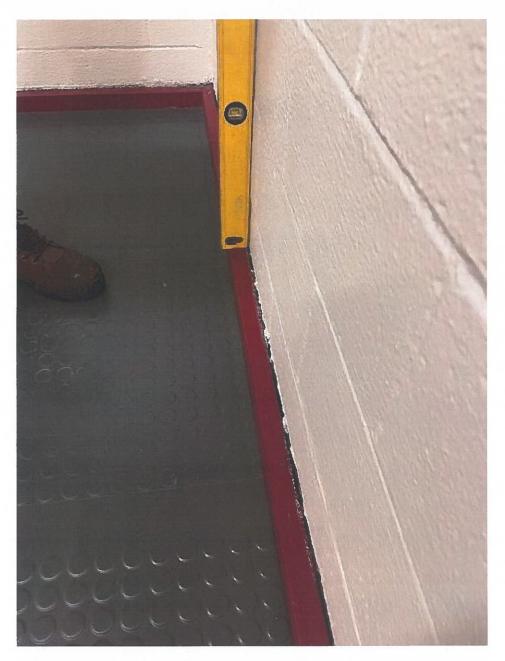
Exterior wall above the doorway in Figure 2 is leaning away from the building evidenced by the batter of the wall and opening between steel deck at stairwell.
